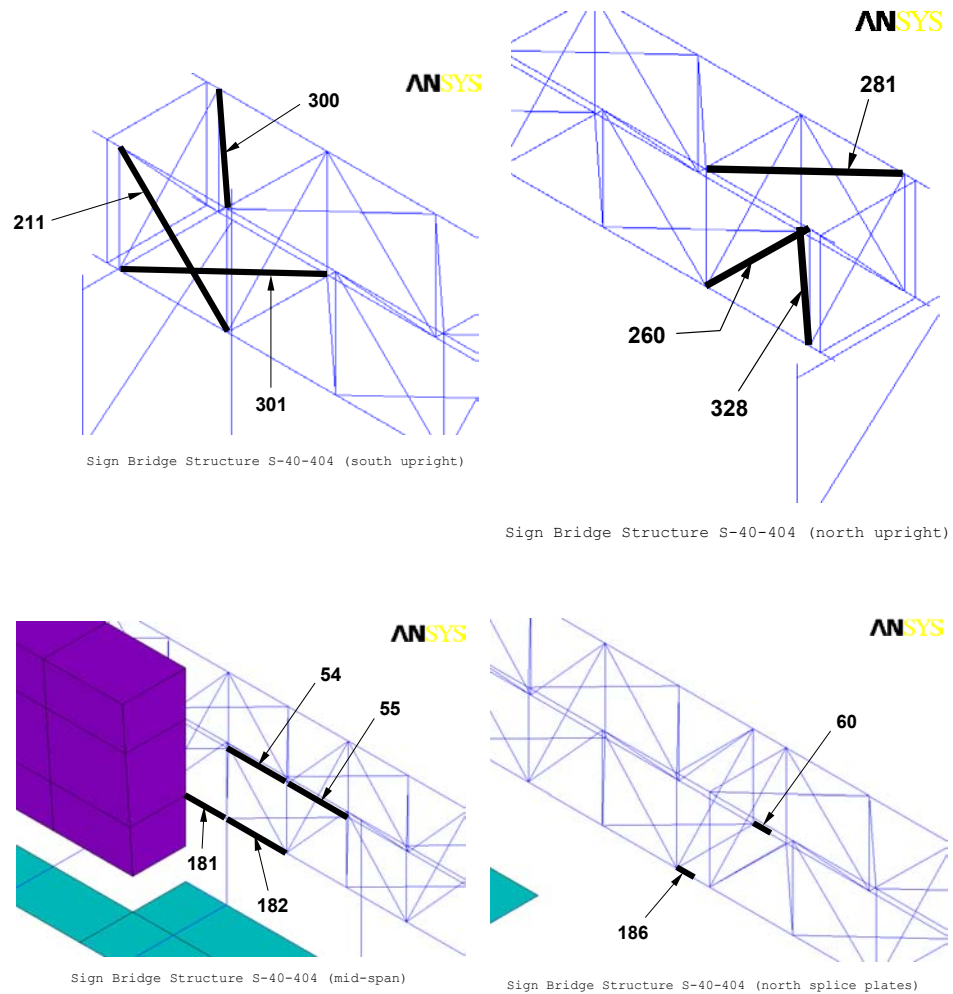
Critical Overhead Truss Web and Chord Members of Sign Bridge S-40-404 (Ginal 2003).
